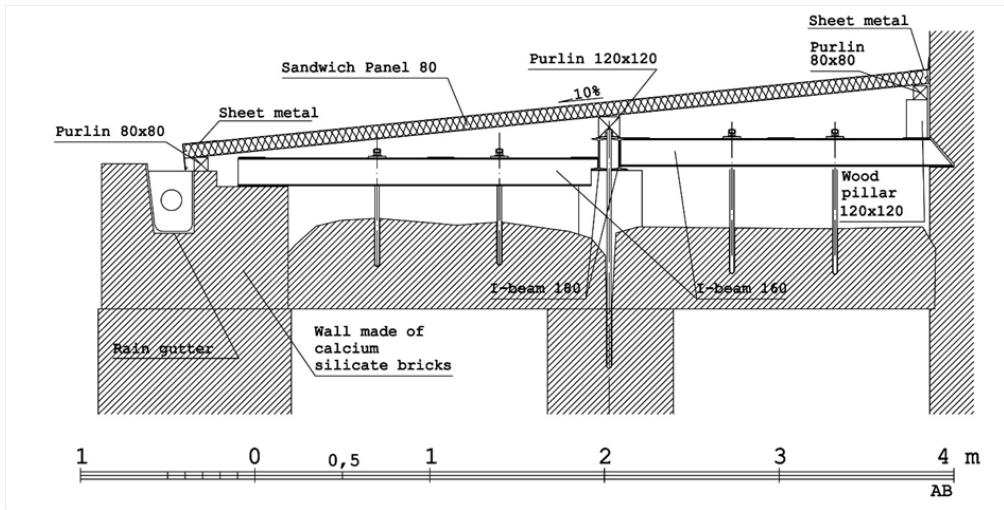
Project of the strengthening and roofing of the Vestibule of the Hathor Chapel ceiling section.
